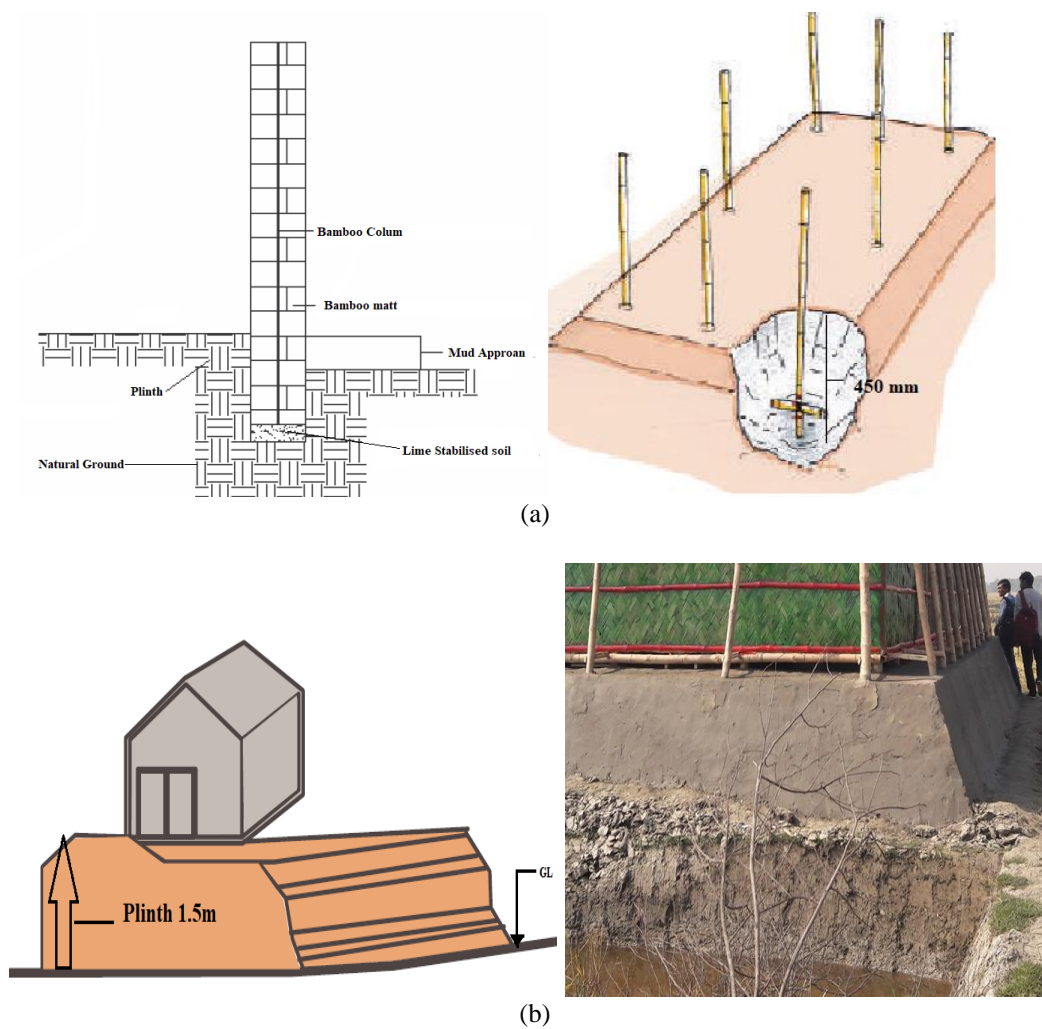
(a) Foundation and T-footing work (b) Plinth work of the implemented design.
